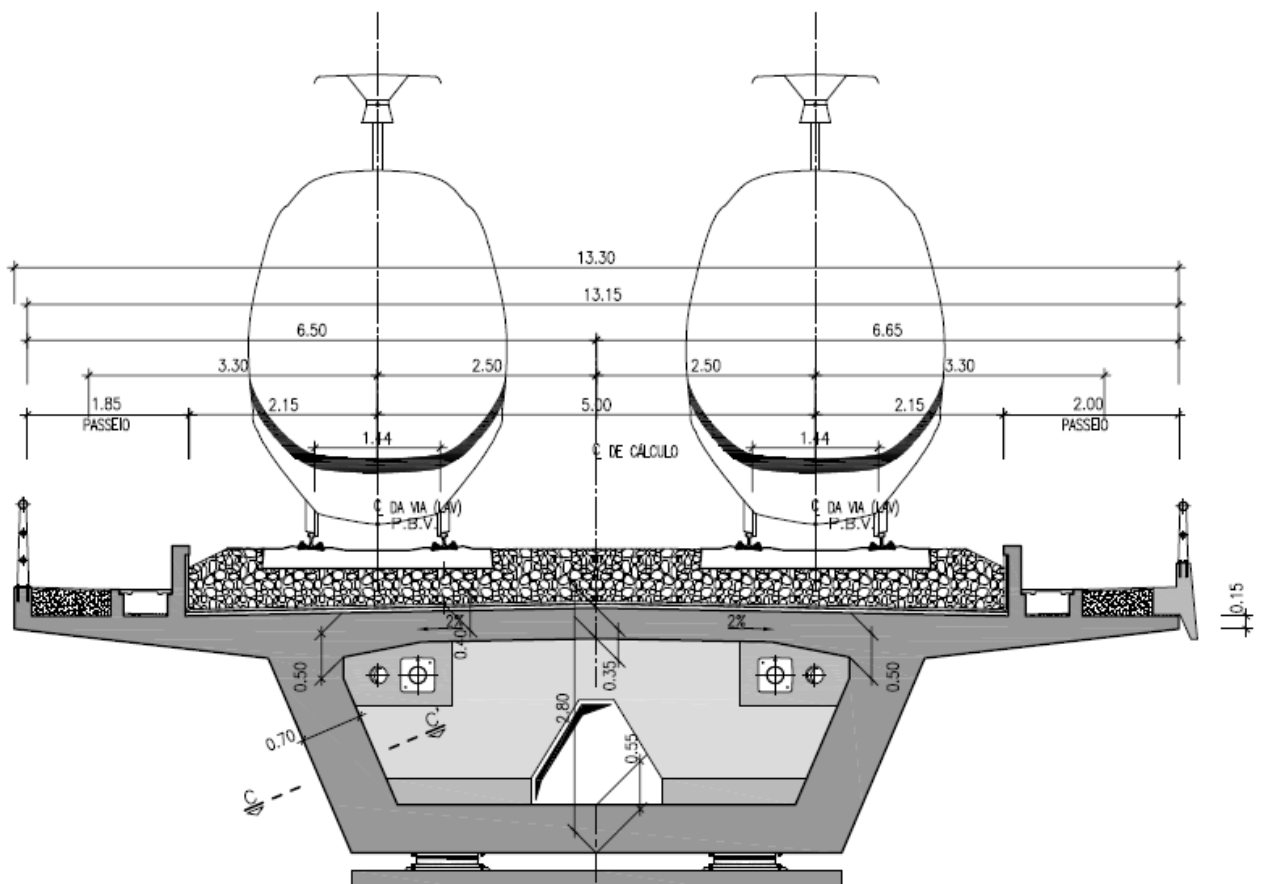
Bridge layout of the cross-section and sketch of the actions considered.
